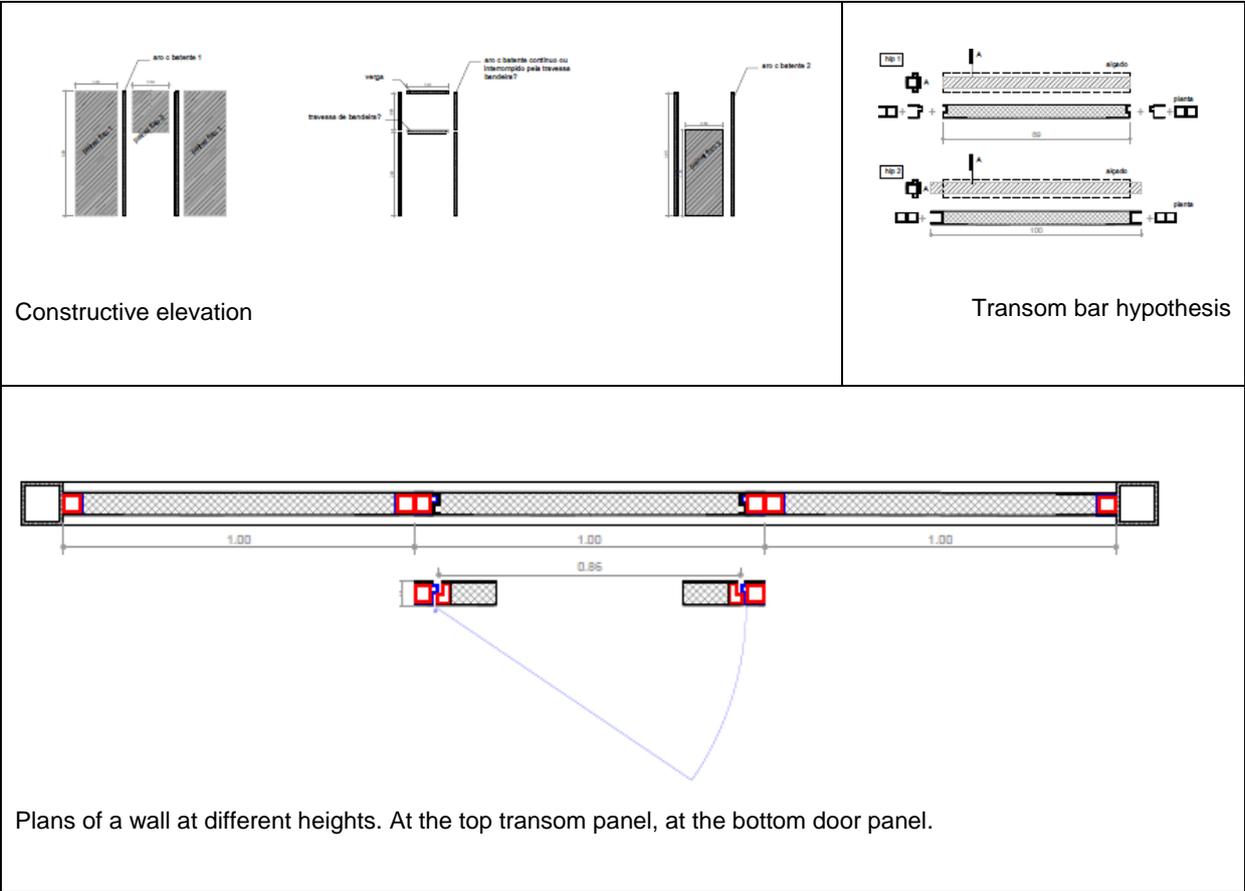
Door's assemblage study: wall panels, doorframe, doorjamb, and transom bar or panel.
